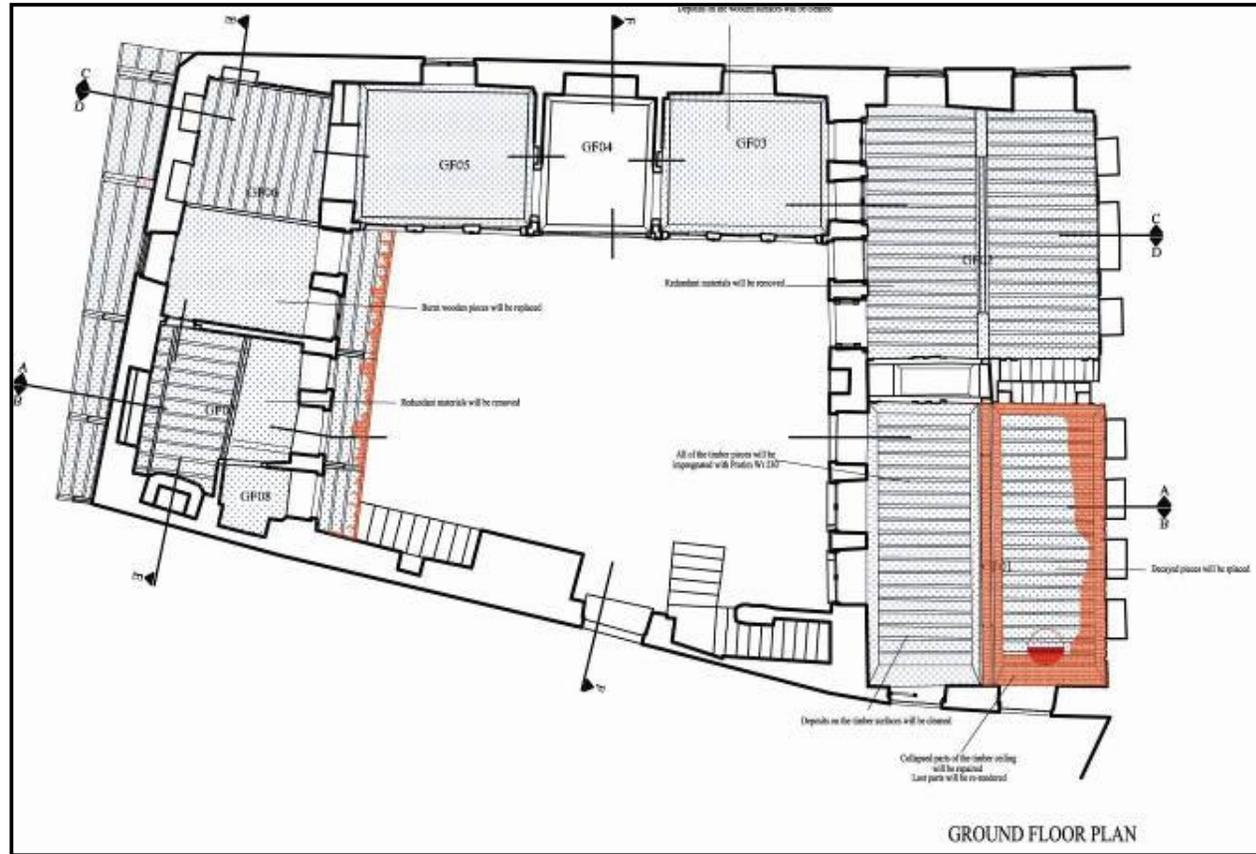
Intervention Decisions – Reflected Ceiling Plan of Ground Floor
